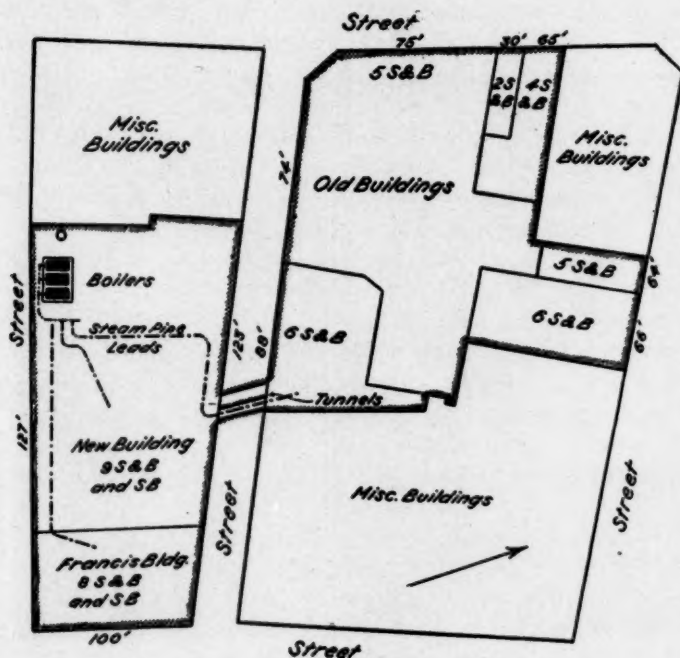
BLOCK PLAN OF THE BUILDING SHOWING BOILER PLANT.
